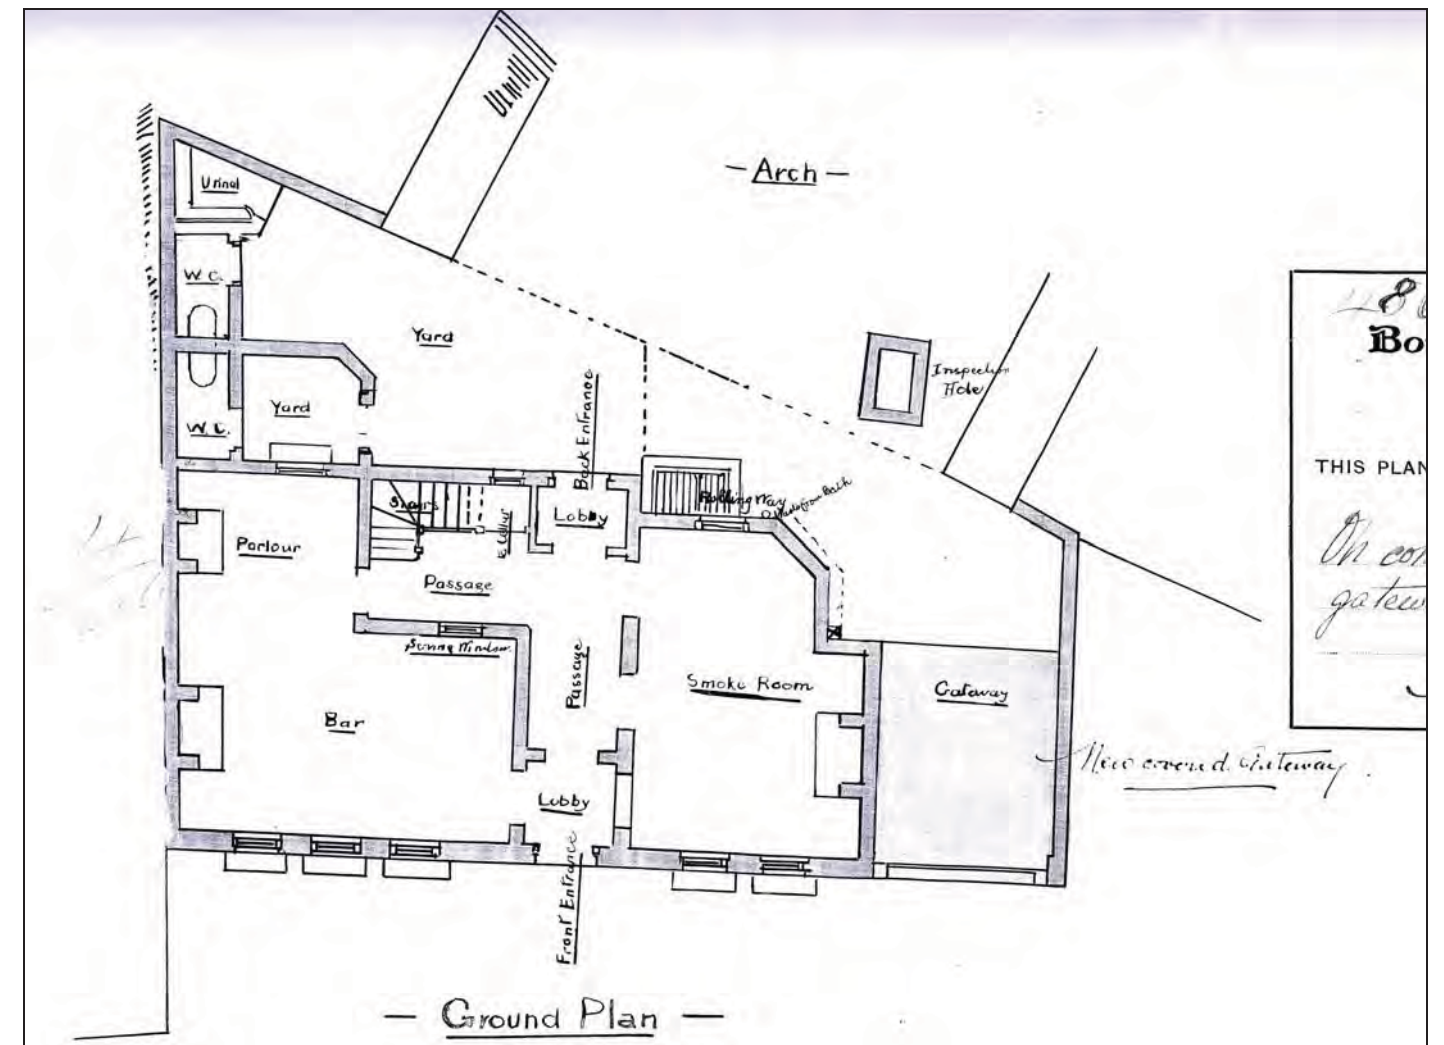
LBR Plan 4860 of 1897. No. 10 Northgate Street, ground floor plan, not shown to scale.
